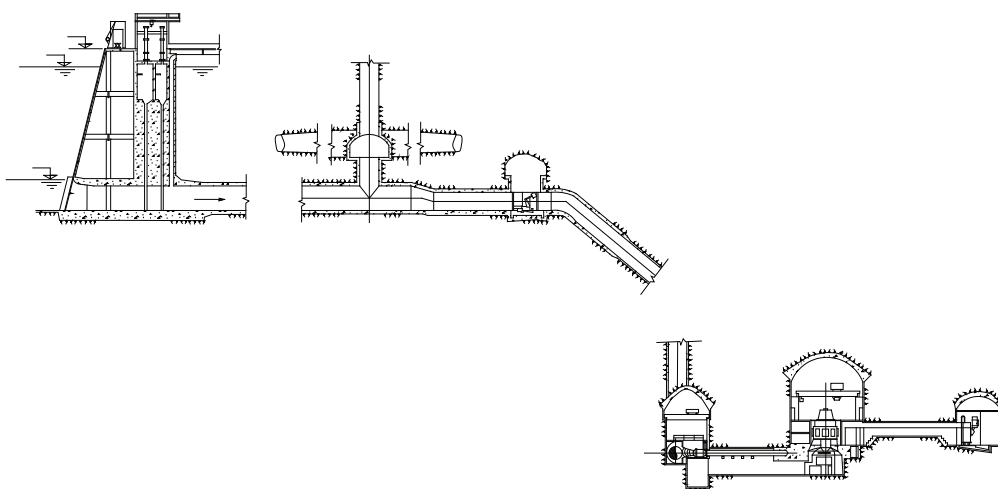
Project with diversion through a penstock (Capivari Cachoeira hydropower plant).
